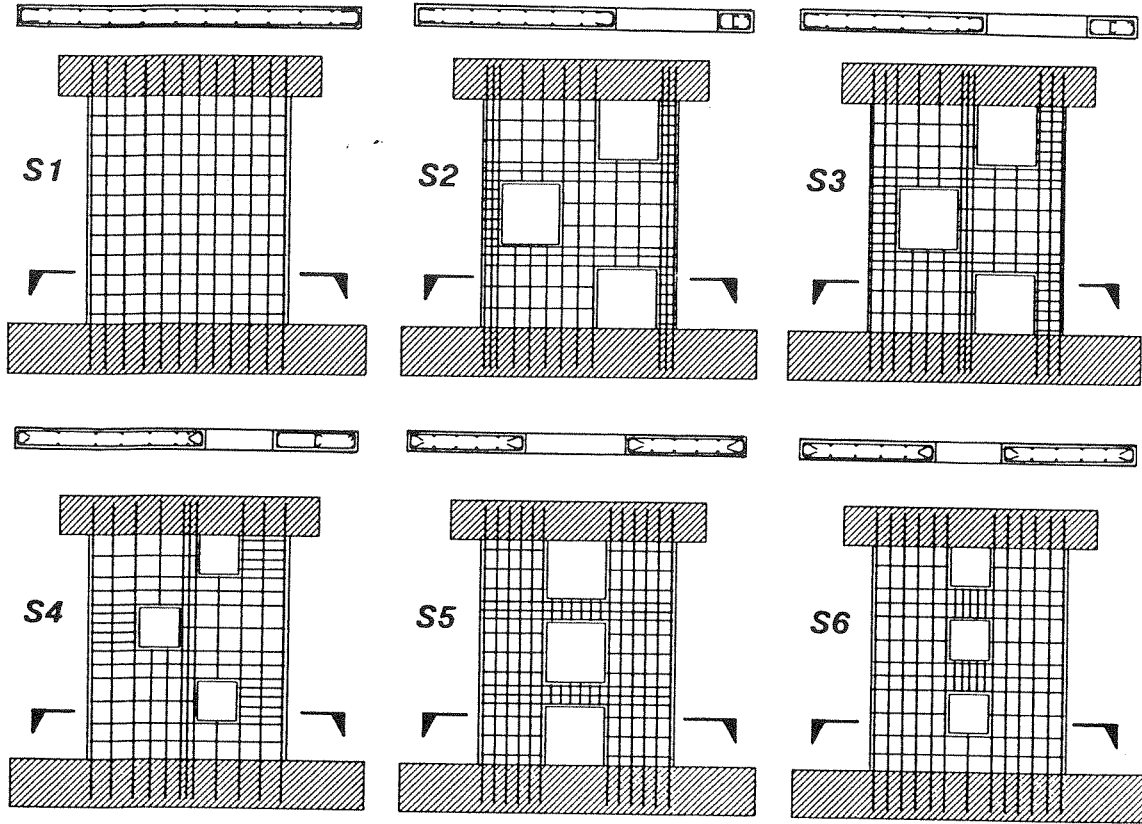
Wall specimens S1 to S6 (cross sections are shown to a larger scale).
